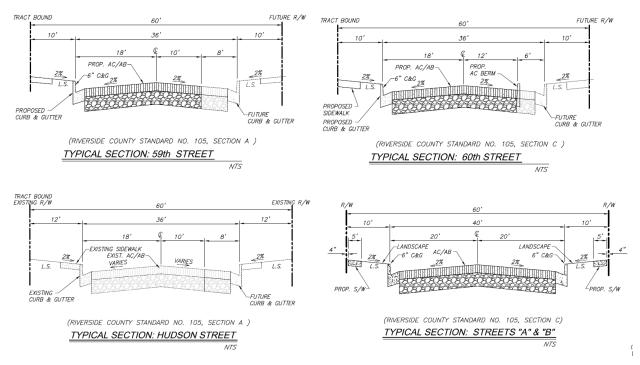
PUBLIC RIGHT-OF-WAY SECTIONS
